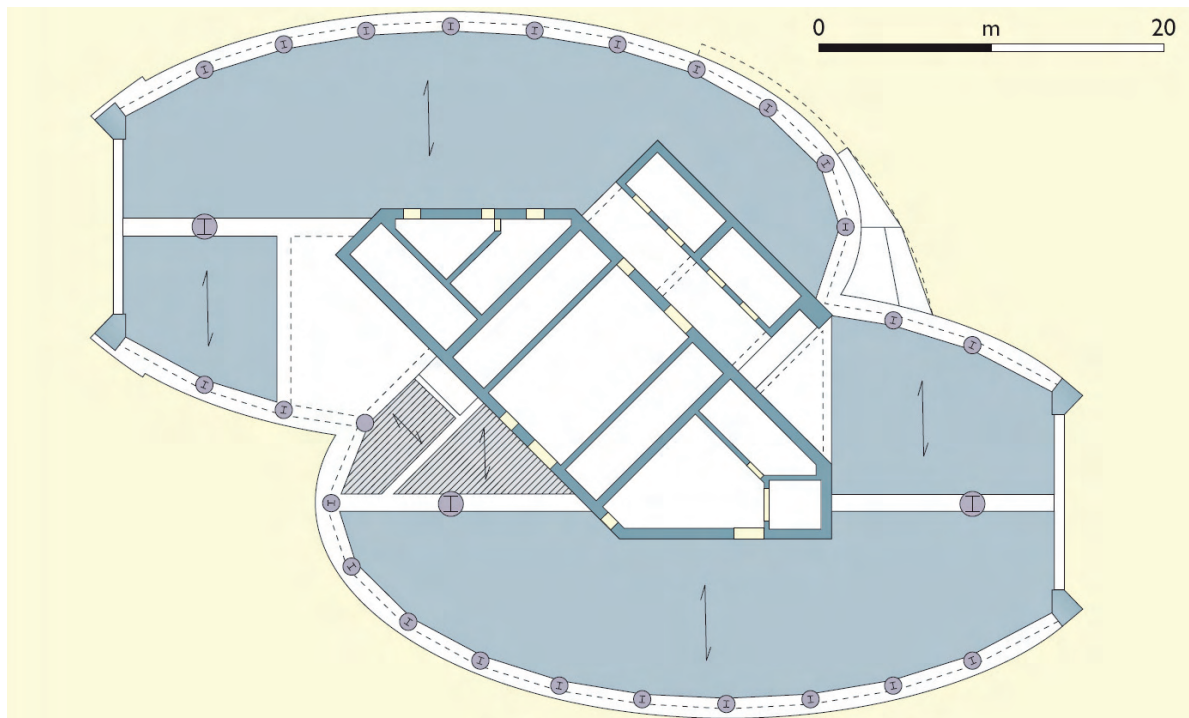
Typical structural floor plan up to level +232m showing hollow core slab supported on external beams to core walls and internal beams
